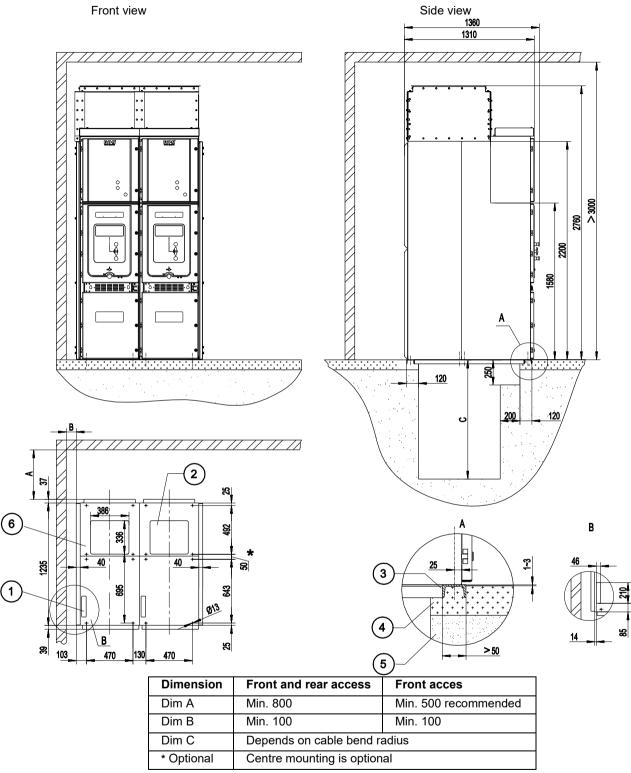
Basic floor plan for bottom cable entry panel rating17.5kV 630/1250A 25/31.5kA
